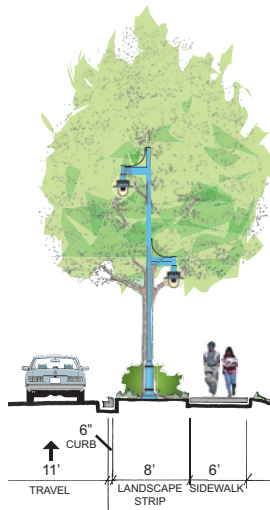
D.42: Partial Cross Section of Typical Sidewalk and Lighting Improvements on Southside of Mare Island Causeway ①
